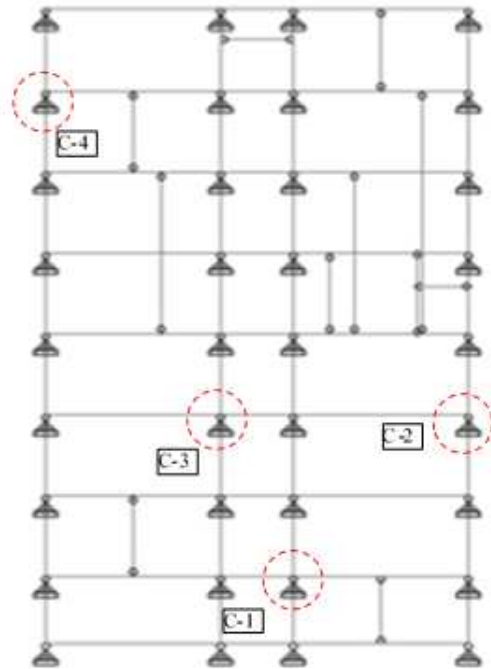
Plan view of Block-A, Jamshedpur Hospital Building (G+4)
